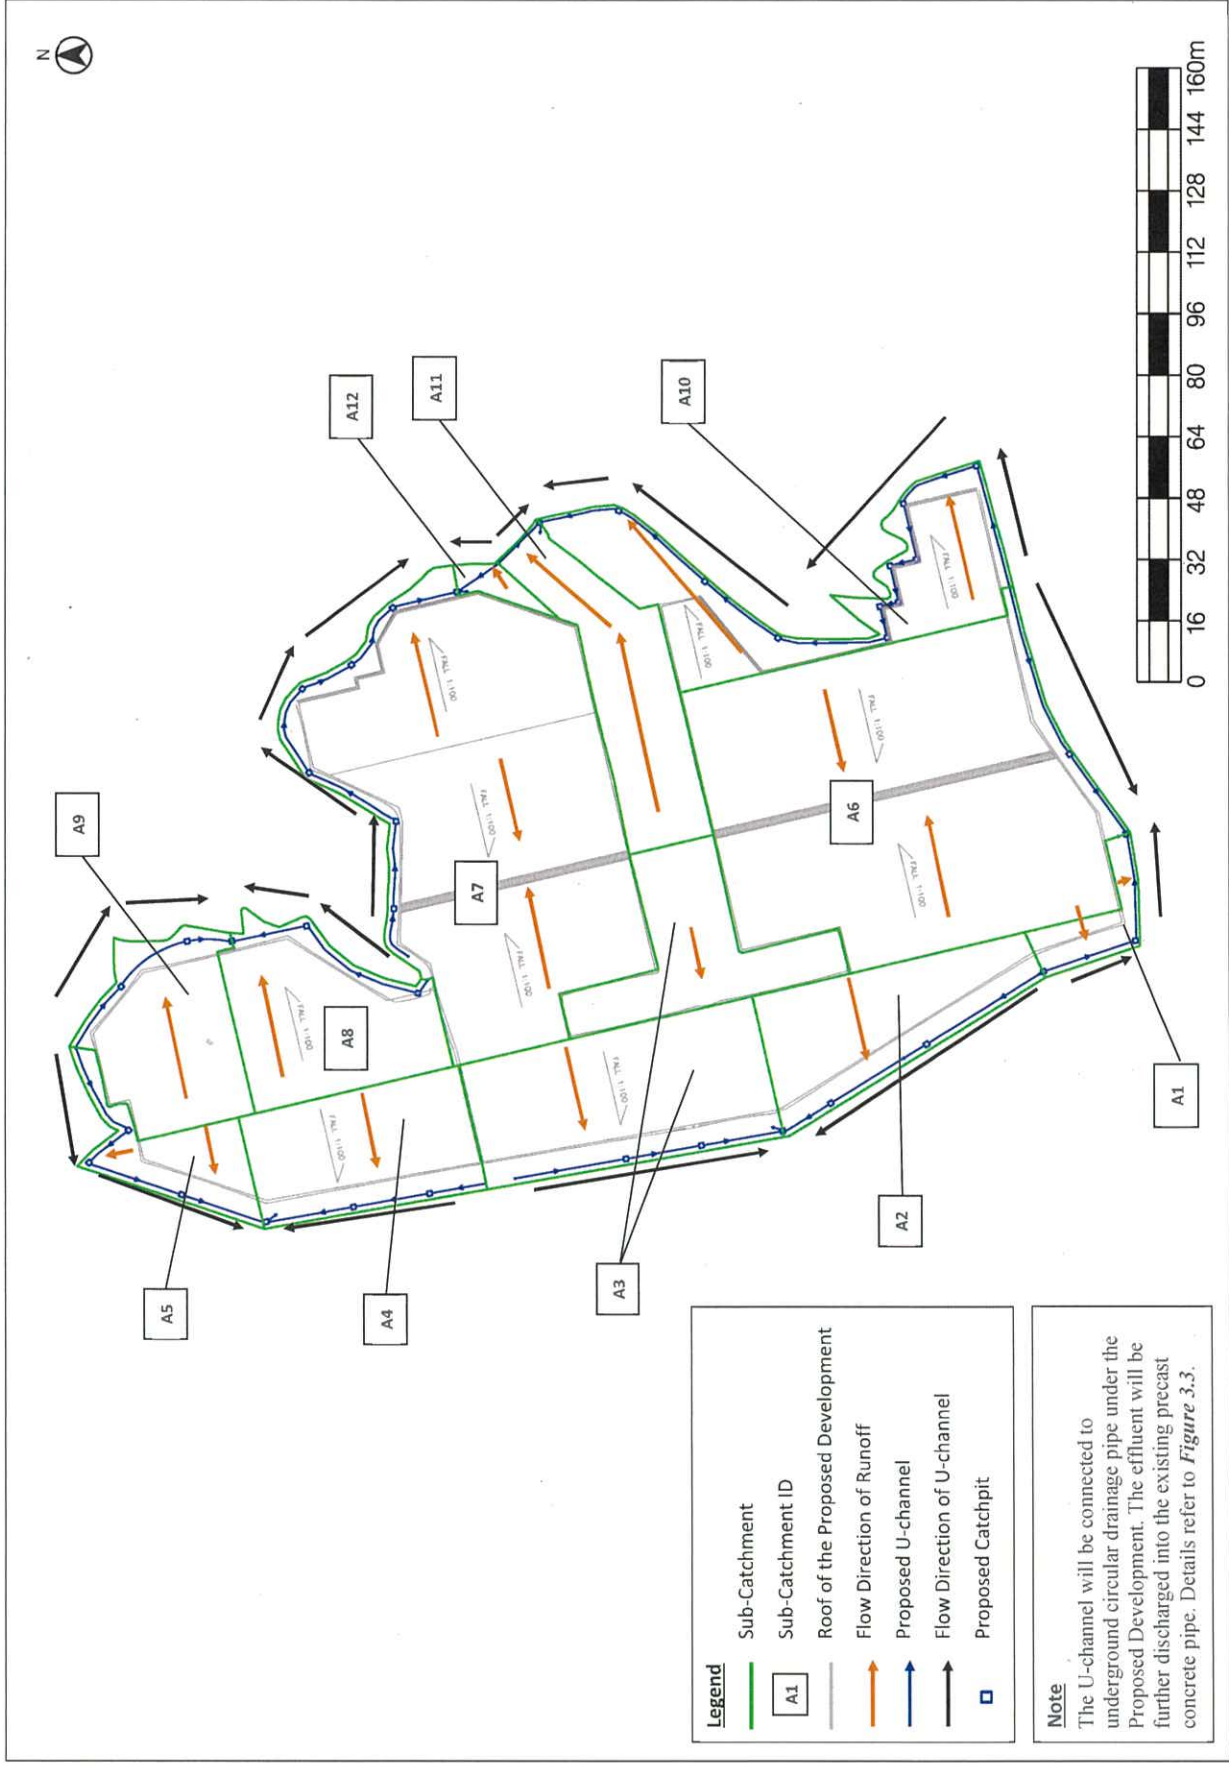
Proposed Drainage Diversion Layout (Sheet 1 of 2)
